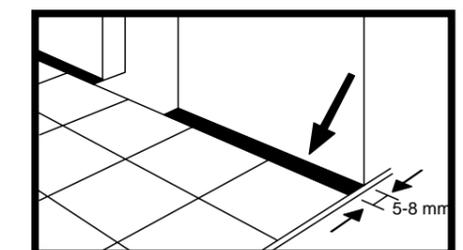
Around fixed elements of the supporting surface, such as walls, steps, columns, etc., it is mandatory to provide 5-8 mm peripheral joints.
